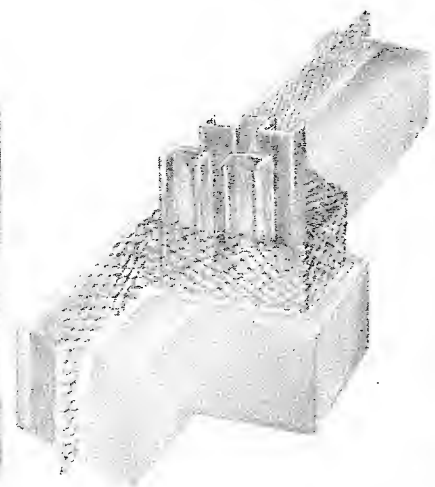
Channel and Metal Lath Reinforced Exterior Bearing Wall.
